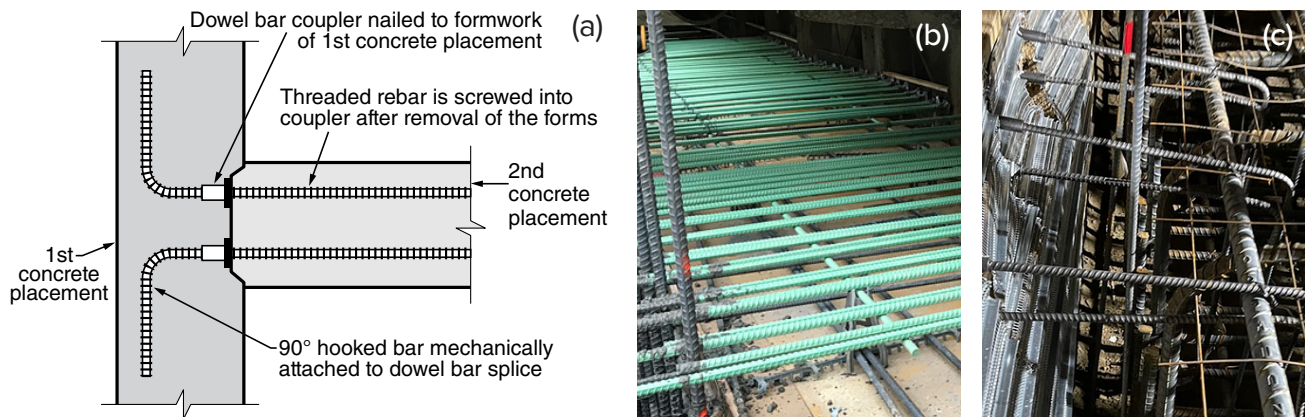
Examples of dowel bar couplers at construction joints: (a) a suggested detail from “*Design Guide for Economical Reinforced Concrete Structures*”; (b) couplers attached to slab formwork (image courtesy of McHugh); and (c) couplers in a foundation construction joint incorporating a stay-in-place form (image courtesy of Hensel Phelps). Note that threaded dowel bars must not be bent prior to installation in a coupler.
